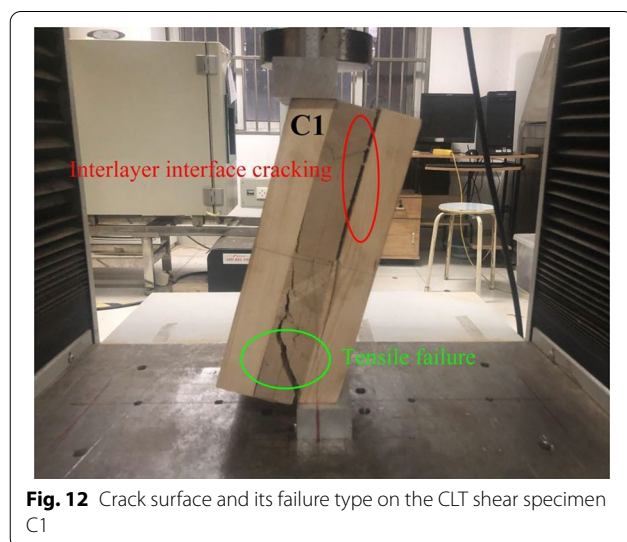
Crack surface and its failure type on the CLT shear specimen C1
